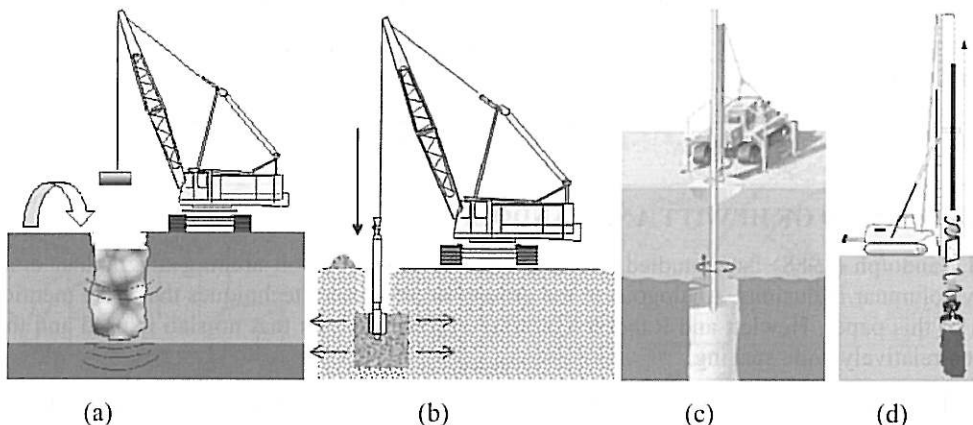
(a) dynamic replacement, (b) stone column, (c) jet grouting, (d) controlled modulus columns
